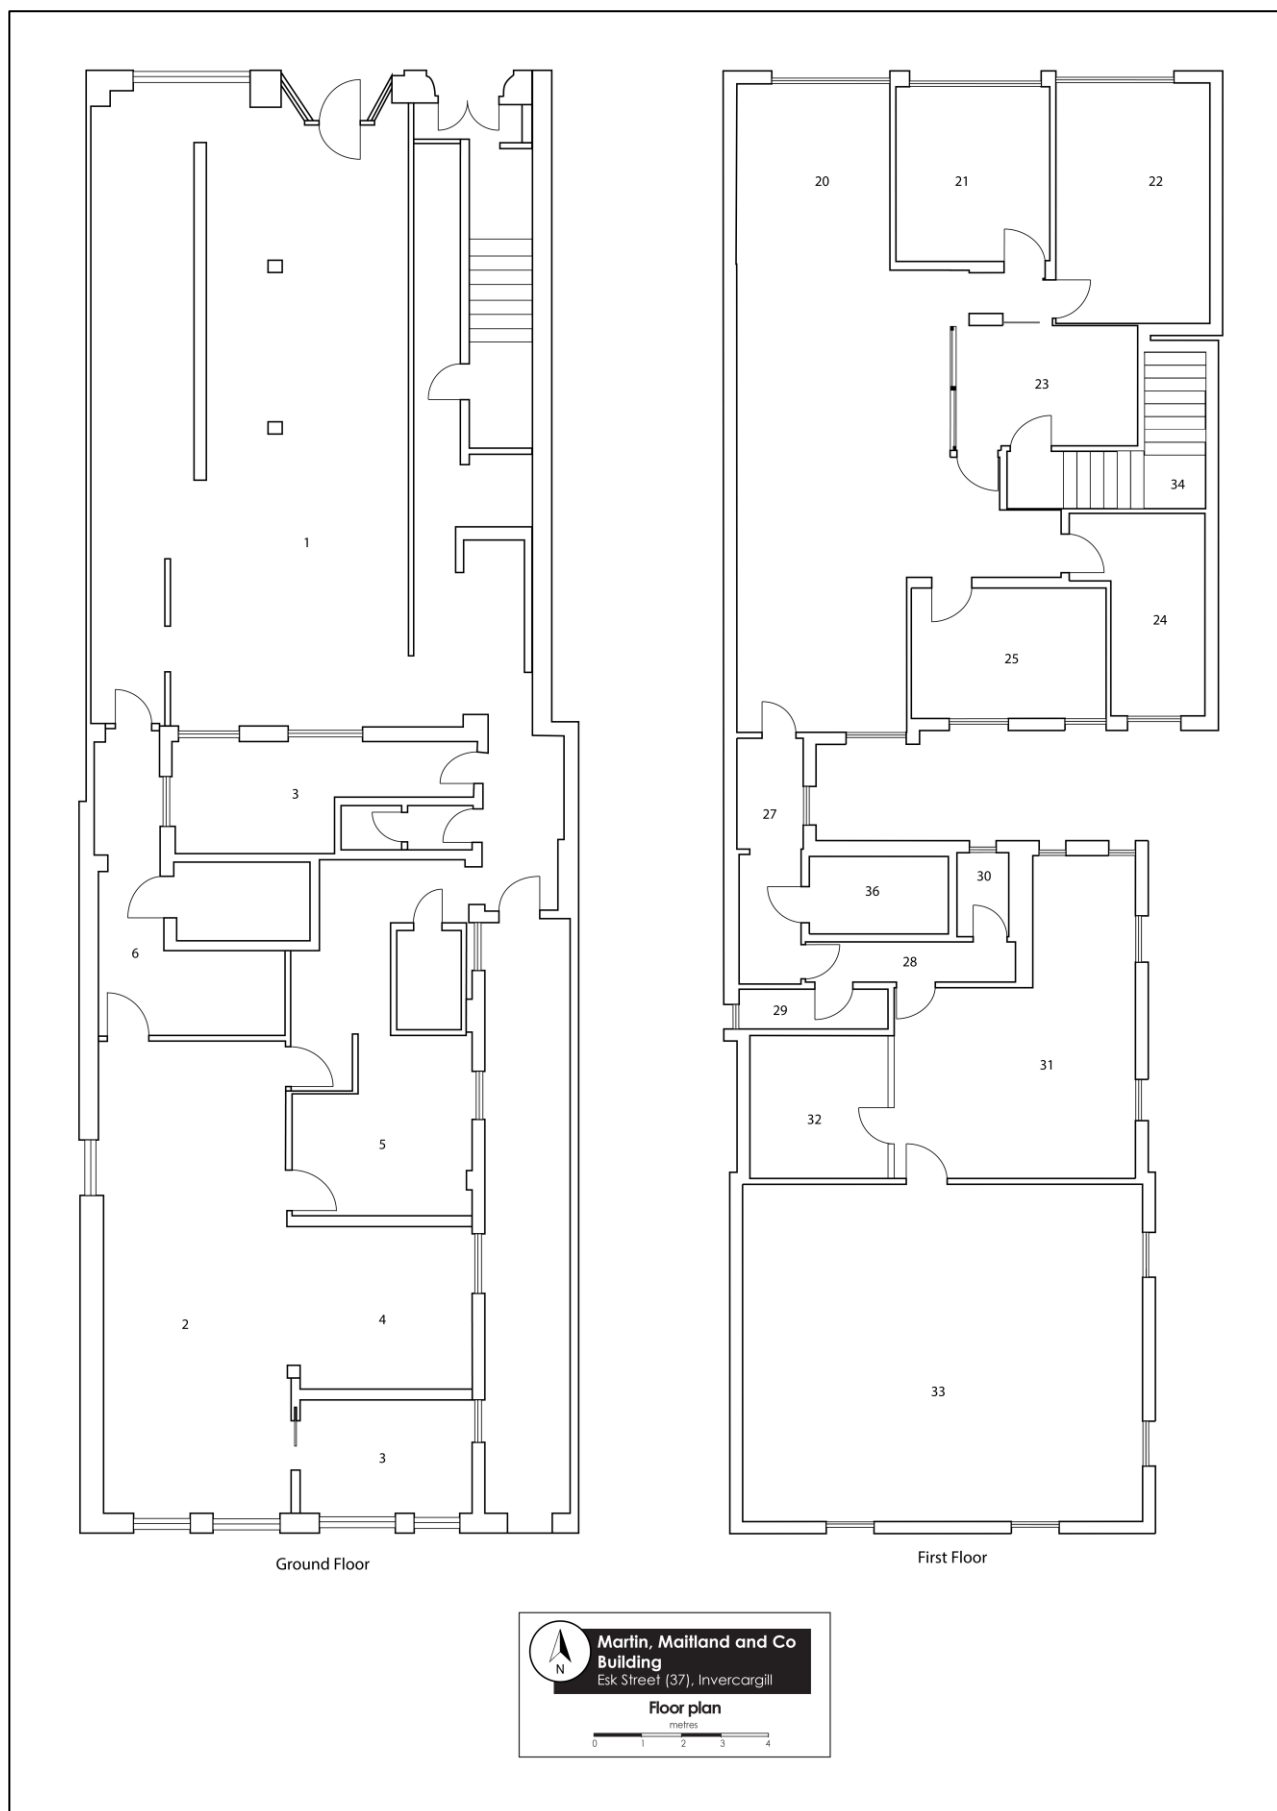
Ground (left) and first (right) floor plans of Martin, Maitland and Co.'s Building.
